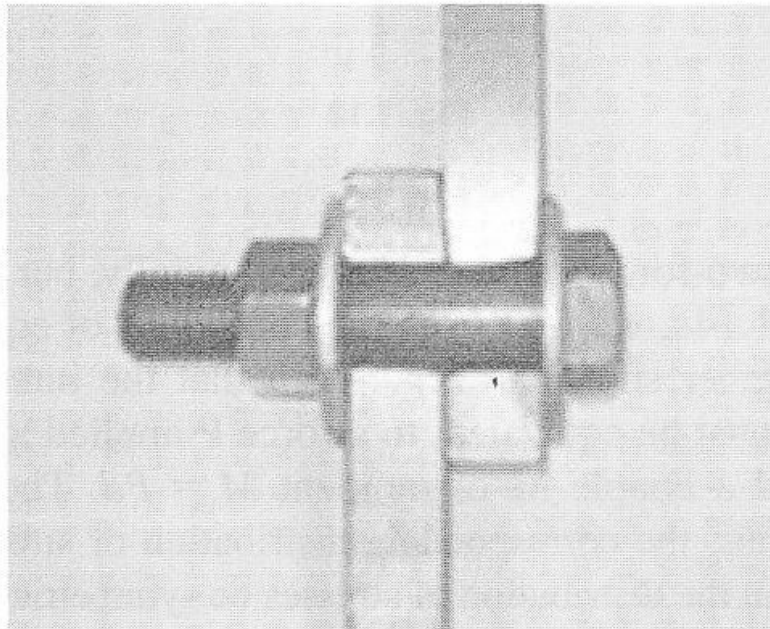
Cutaway view of a connection with a bolt in shear.
